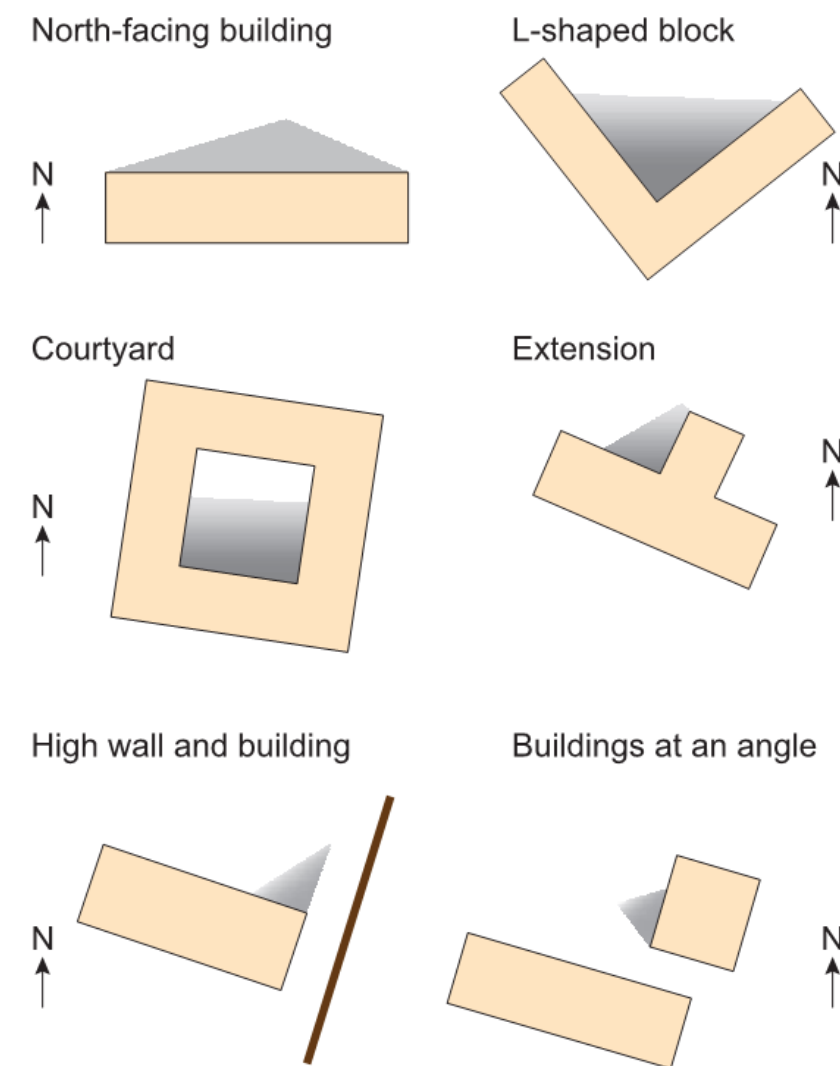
Layouts of buildings where poor daylighting and sunlighting would occur ground floor
